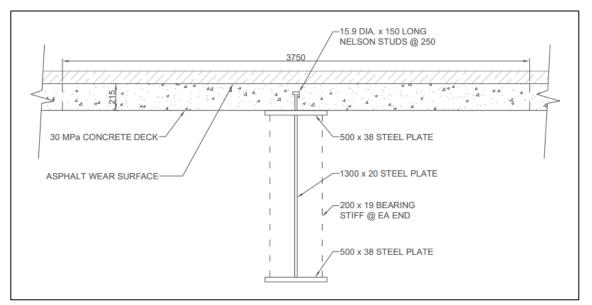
Steel Plate Girder Preliminary Design Section (Alloy Consulting Ltd., 2015)
